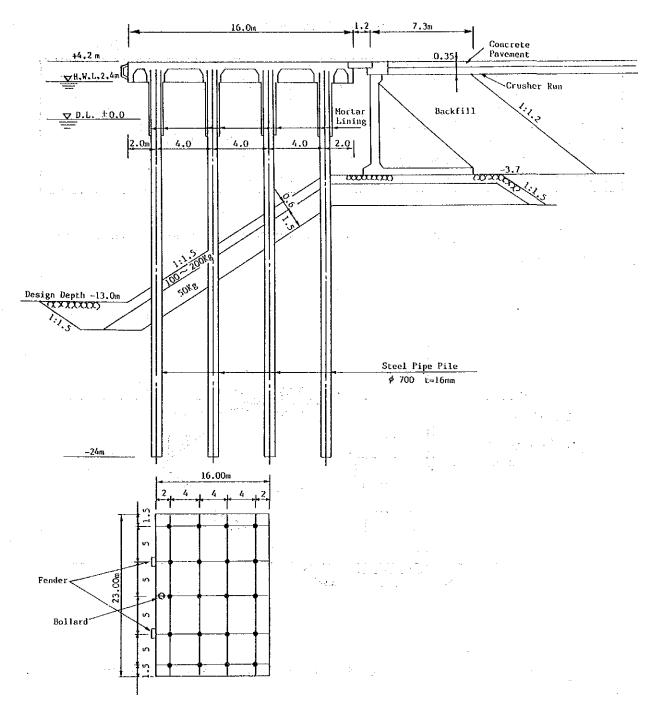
Proposed Cross Section of the Berth (-13m) (Alternative)
